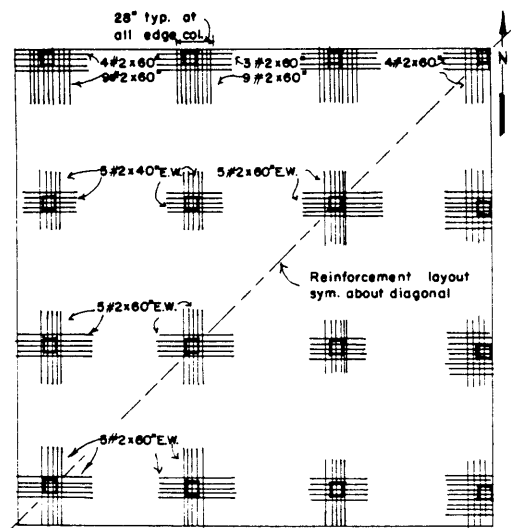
Bonded Reinforcement (1 in. = 25.4 mm)
